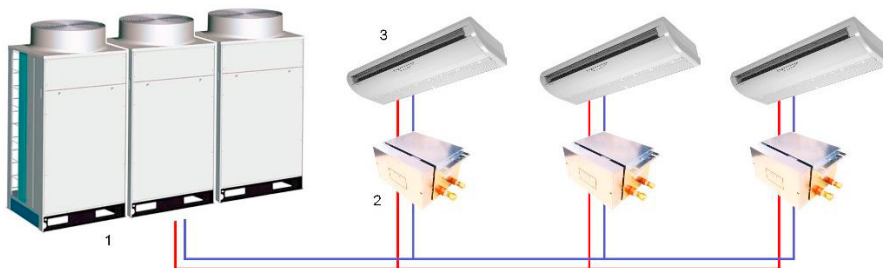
Cooling system layout during summer: 1. external modules; 2. remote expansion valve; 3. split.
